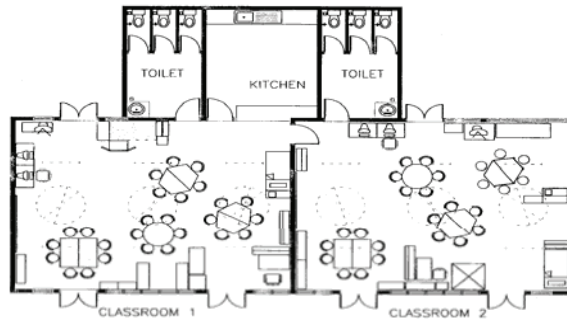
Example of layout floor-plan renovated existing public preschool classroom
